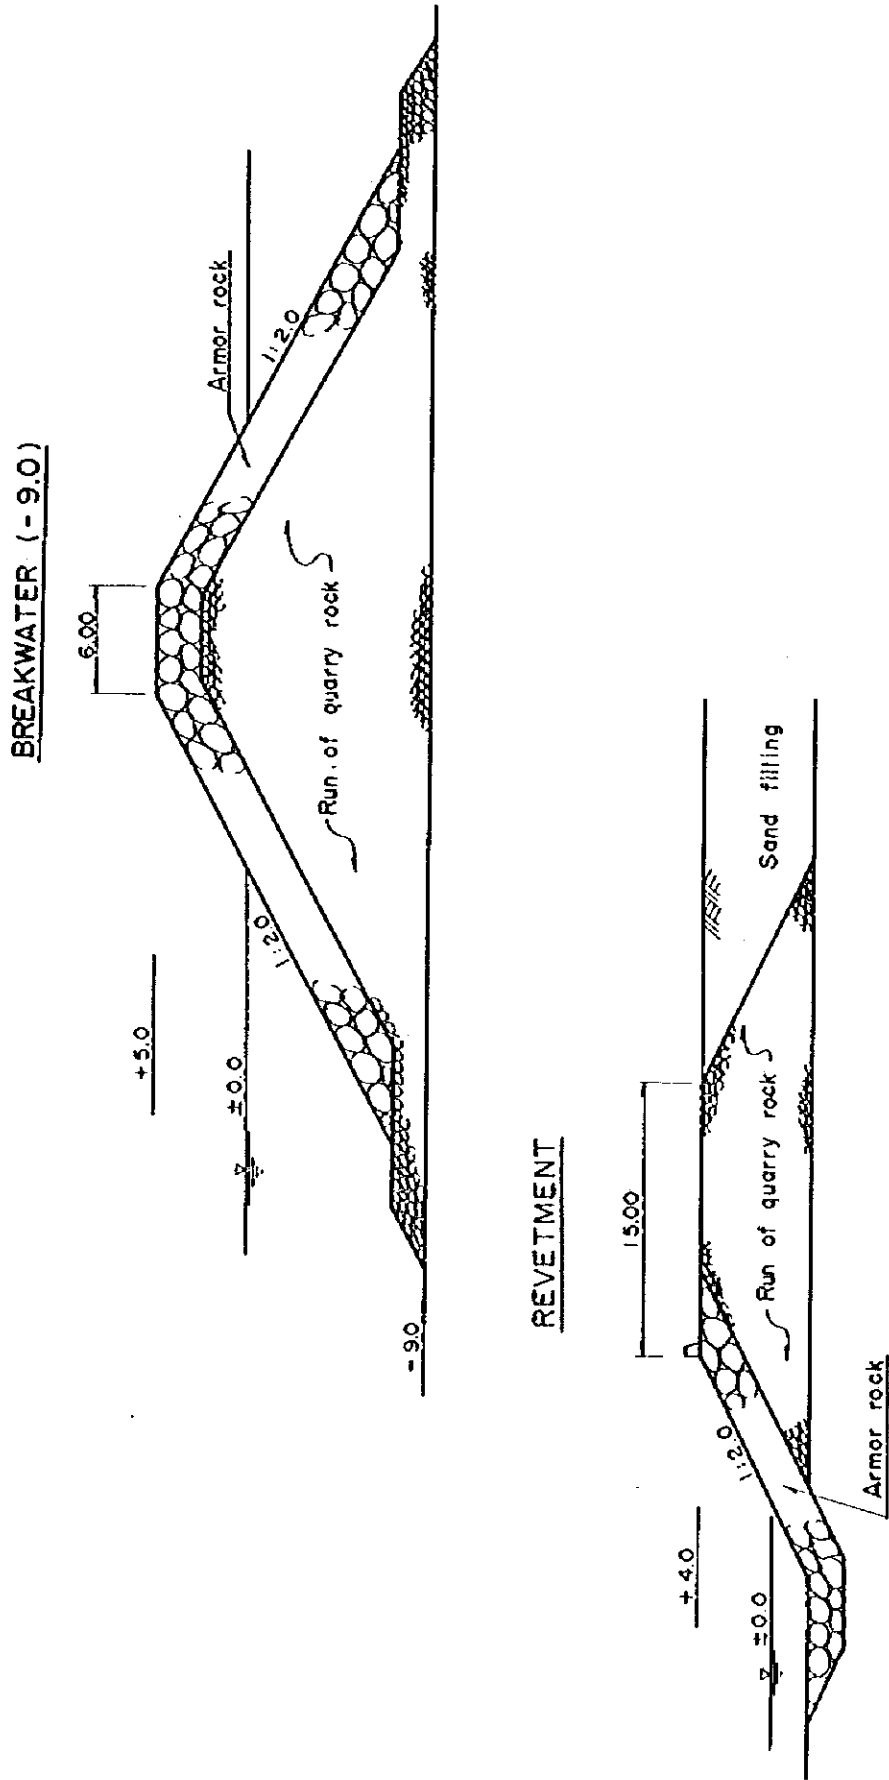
TYPICAL SECTION OF REVETMENT FOR ROBERTSPORT SITE / ALT. II
